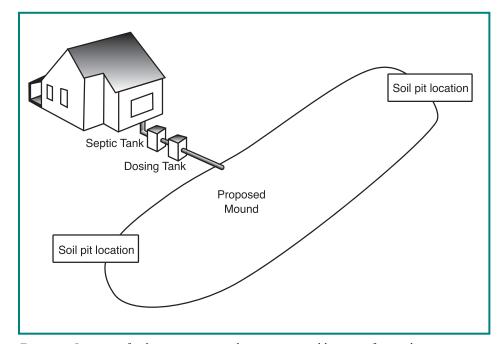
Location of soil pit excavations relative to proposed location of mound system.
